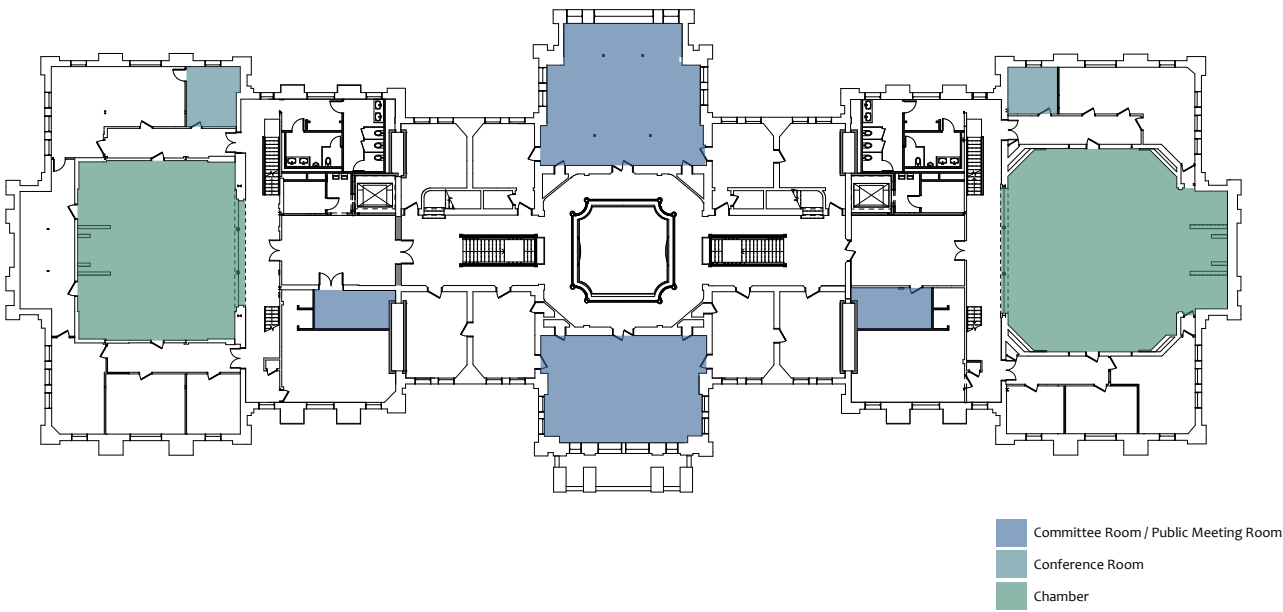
Proposed Conference / Committee Rooms - Second Floor [Capitol]
